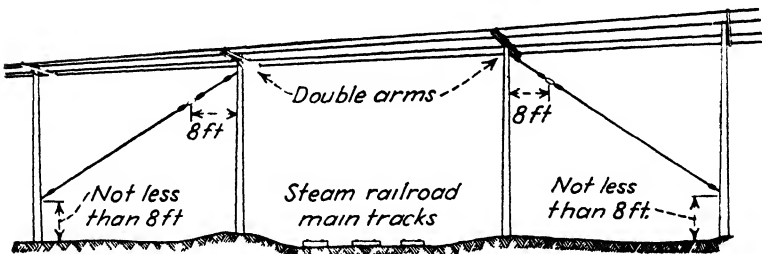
Line reinforcement by use of double crossarms and head guys of a railroad crossing.
